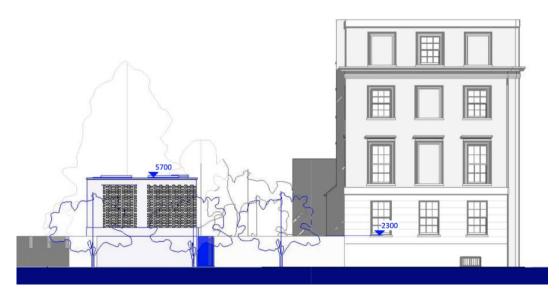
Streetscene section of propsed development showing modest and suvservient relationship with adjojing building on Eversholt Street.
